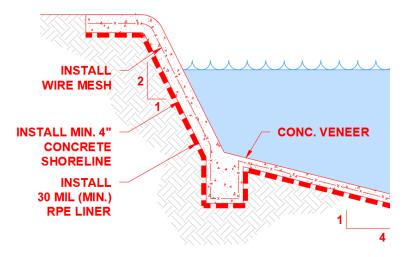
Rebuild Shoreline (Regrade) w/ 30 mil. (min) RPE Liner
